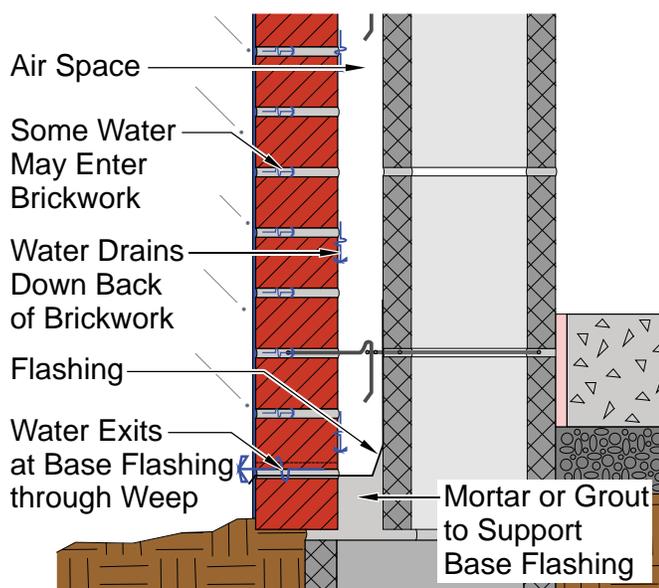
Drainage Wall Systems. BIA recommends the use of drainage wall systems, as shown above. BIA does *not* recommend the barrier strategy of filling a collar joint between masonry wythes because it places a source of salts in direct contact with the brickwork.
